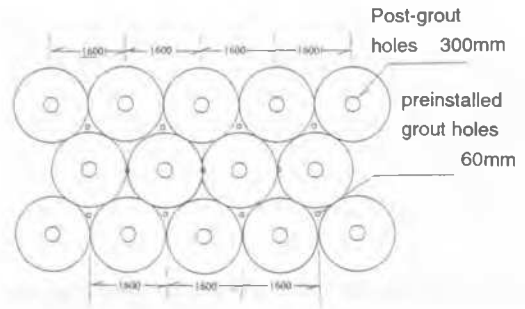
The arrangement of post-grouting piles and preinstalled grout holes
